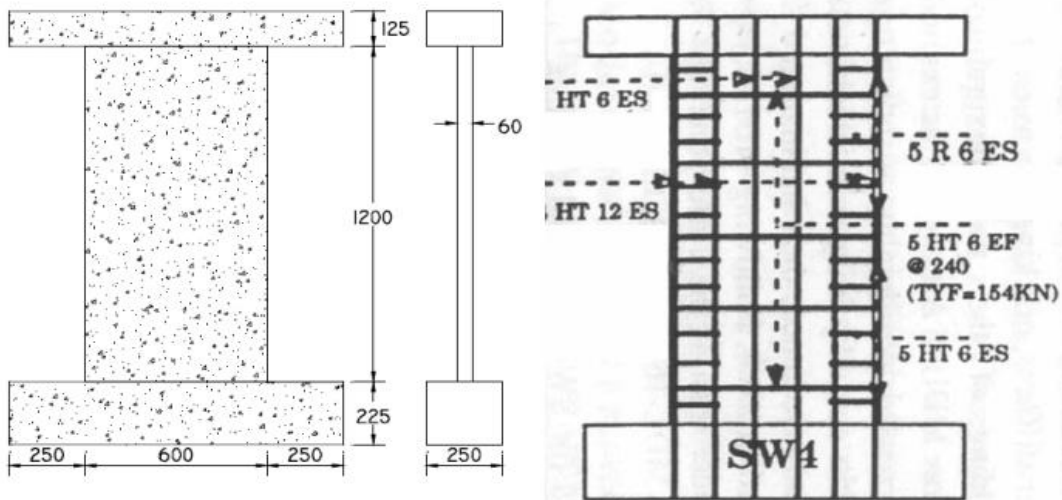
Geometric and reinforcement details of Shear wall SW4 [9].
